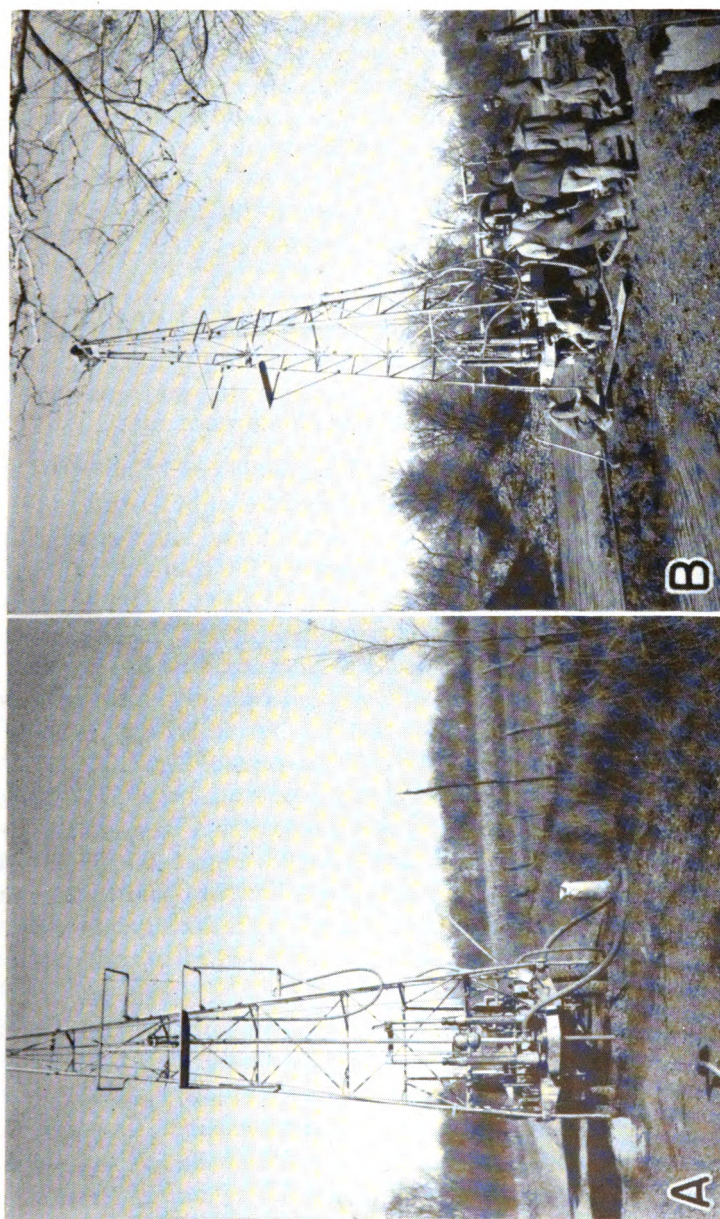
A. Pumping water from test hole 6 with the drilling rig.
